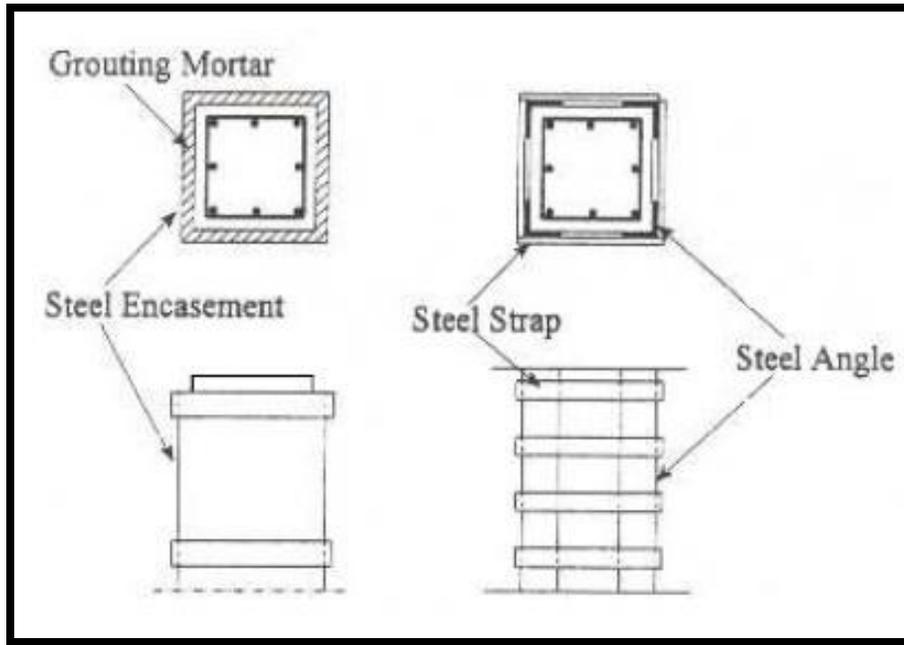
Reinforcing columns using steel sections (Hwaija, 2005)
